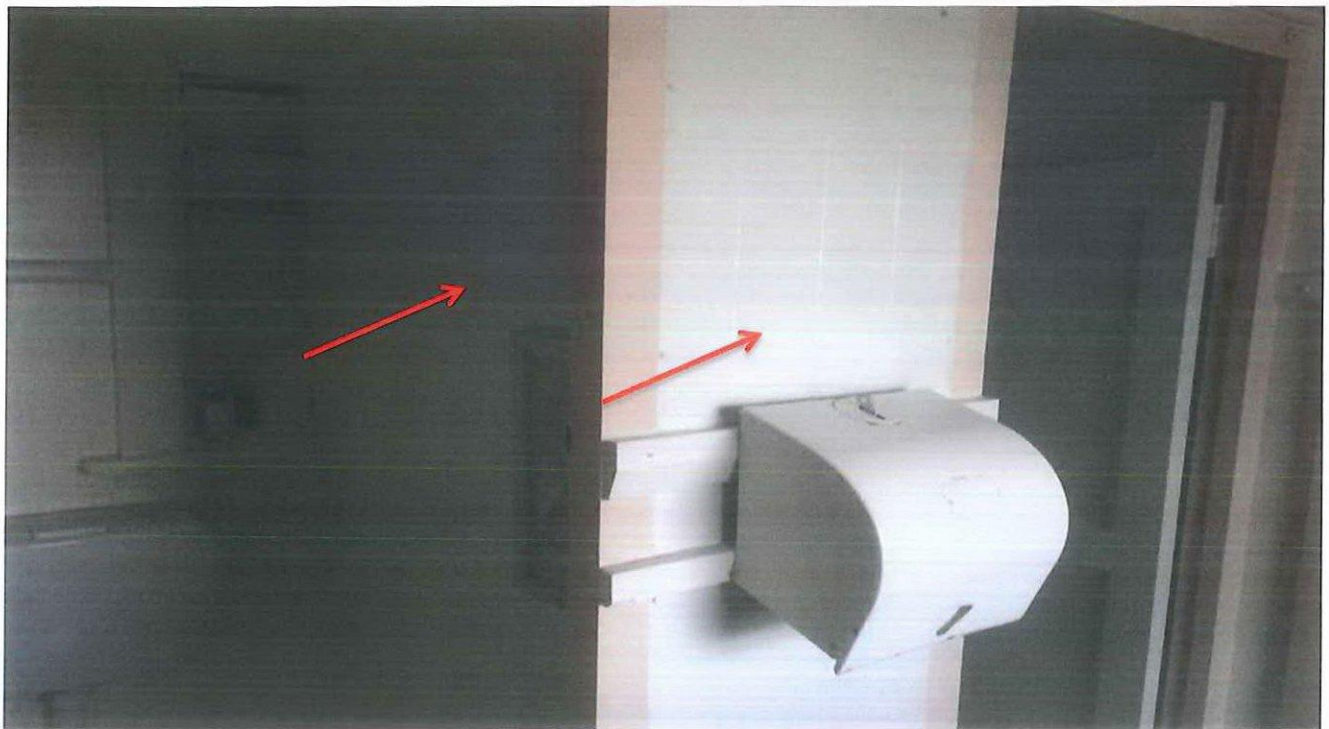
Asset D00040 – Former Lawson Golf Course – Clubhouse – Female Change Rooms – asbestos cement sheet toilet partition wall cladding and cover panels.
